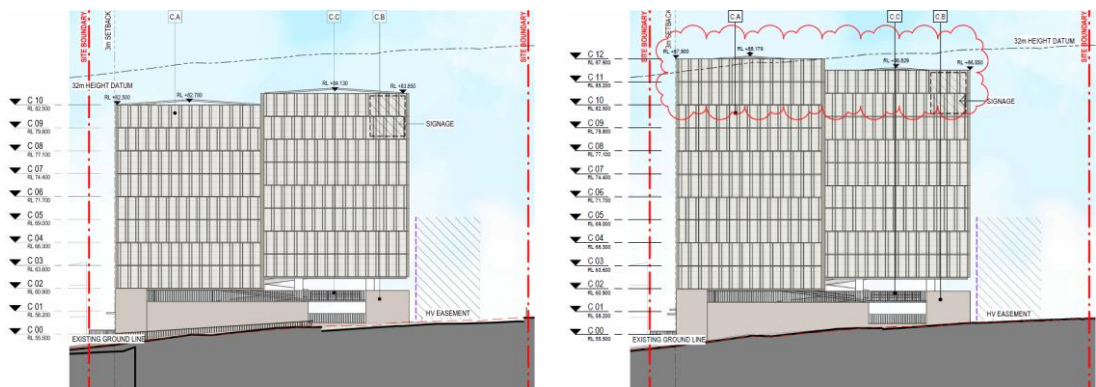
Car park northern elevation as exhibited (left) and as amended (right)
